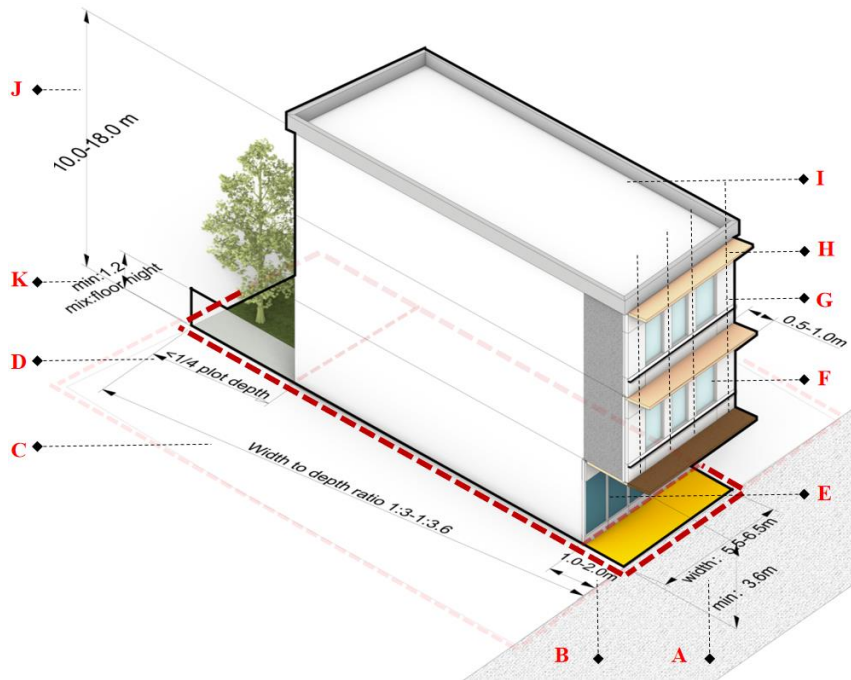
Illustration of floor height and number of floors (Source: by the author)
